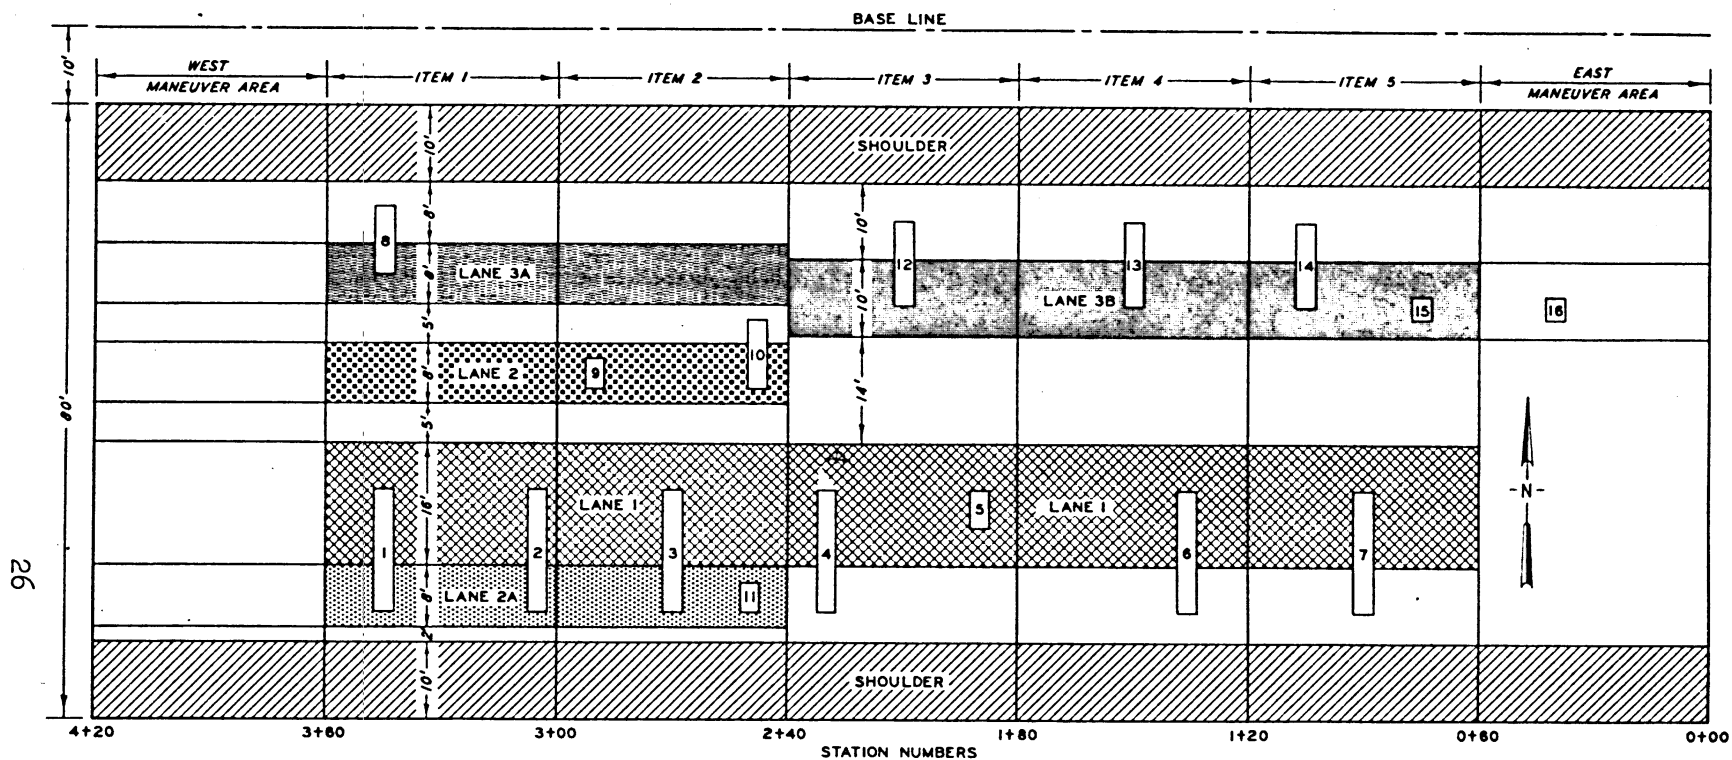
Instrumentation Layout for Rigid Pavement Test Section
